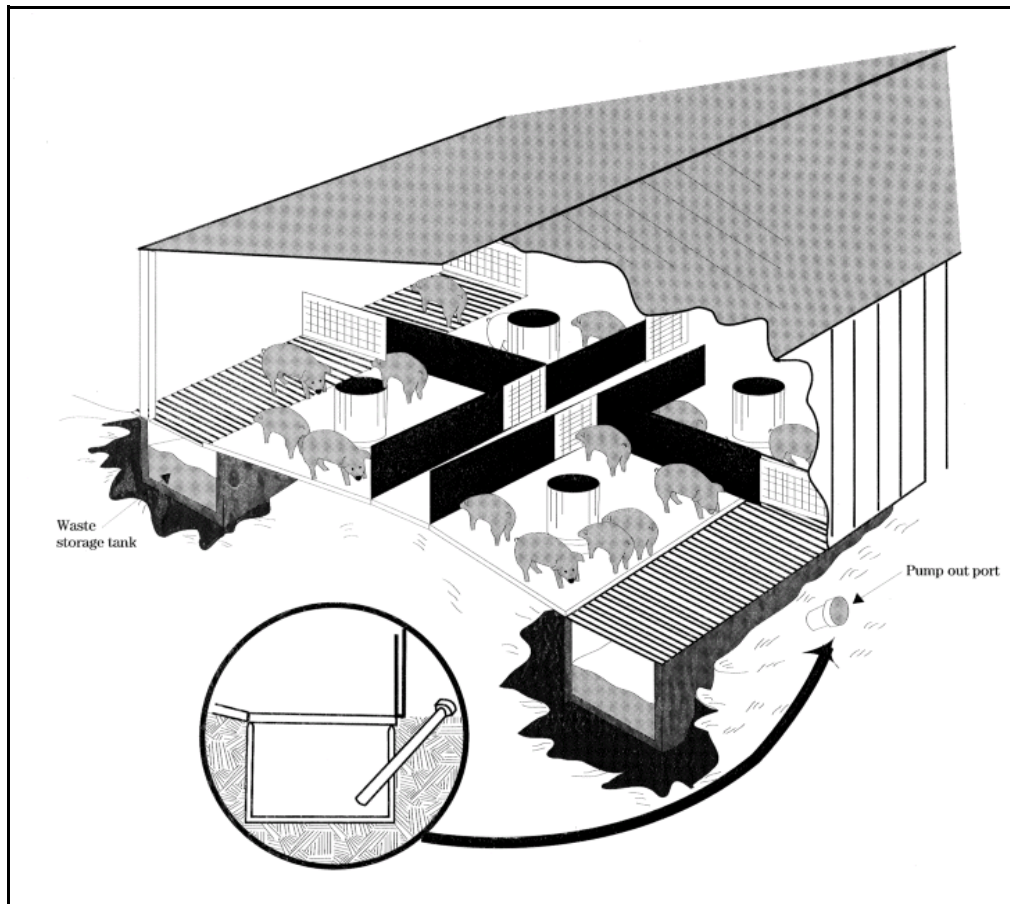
Fed hogs in confined area with concrete floor and tank storage liquid manure handling (from USDA NRCS, 1996).
